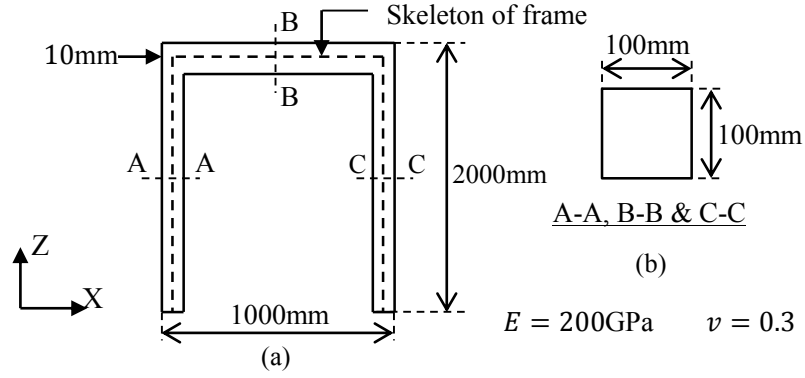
Schematic view of frame: (a) cross-section of frame; and (b) cross-section of A-A, B-B & C-C.
